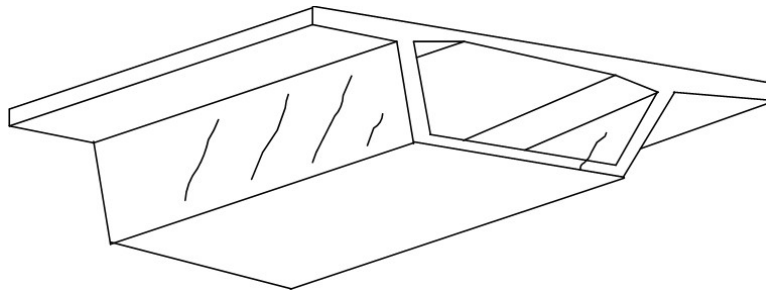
Box Girder Cracks Induced by Shear
